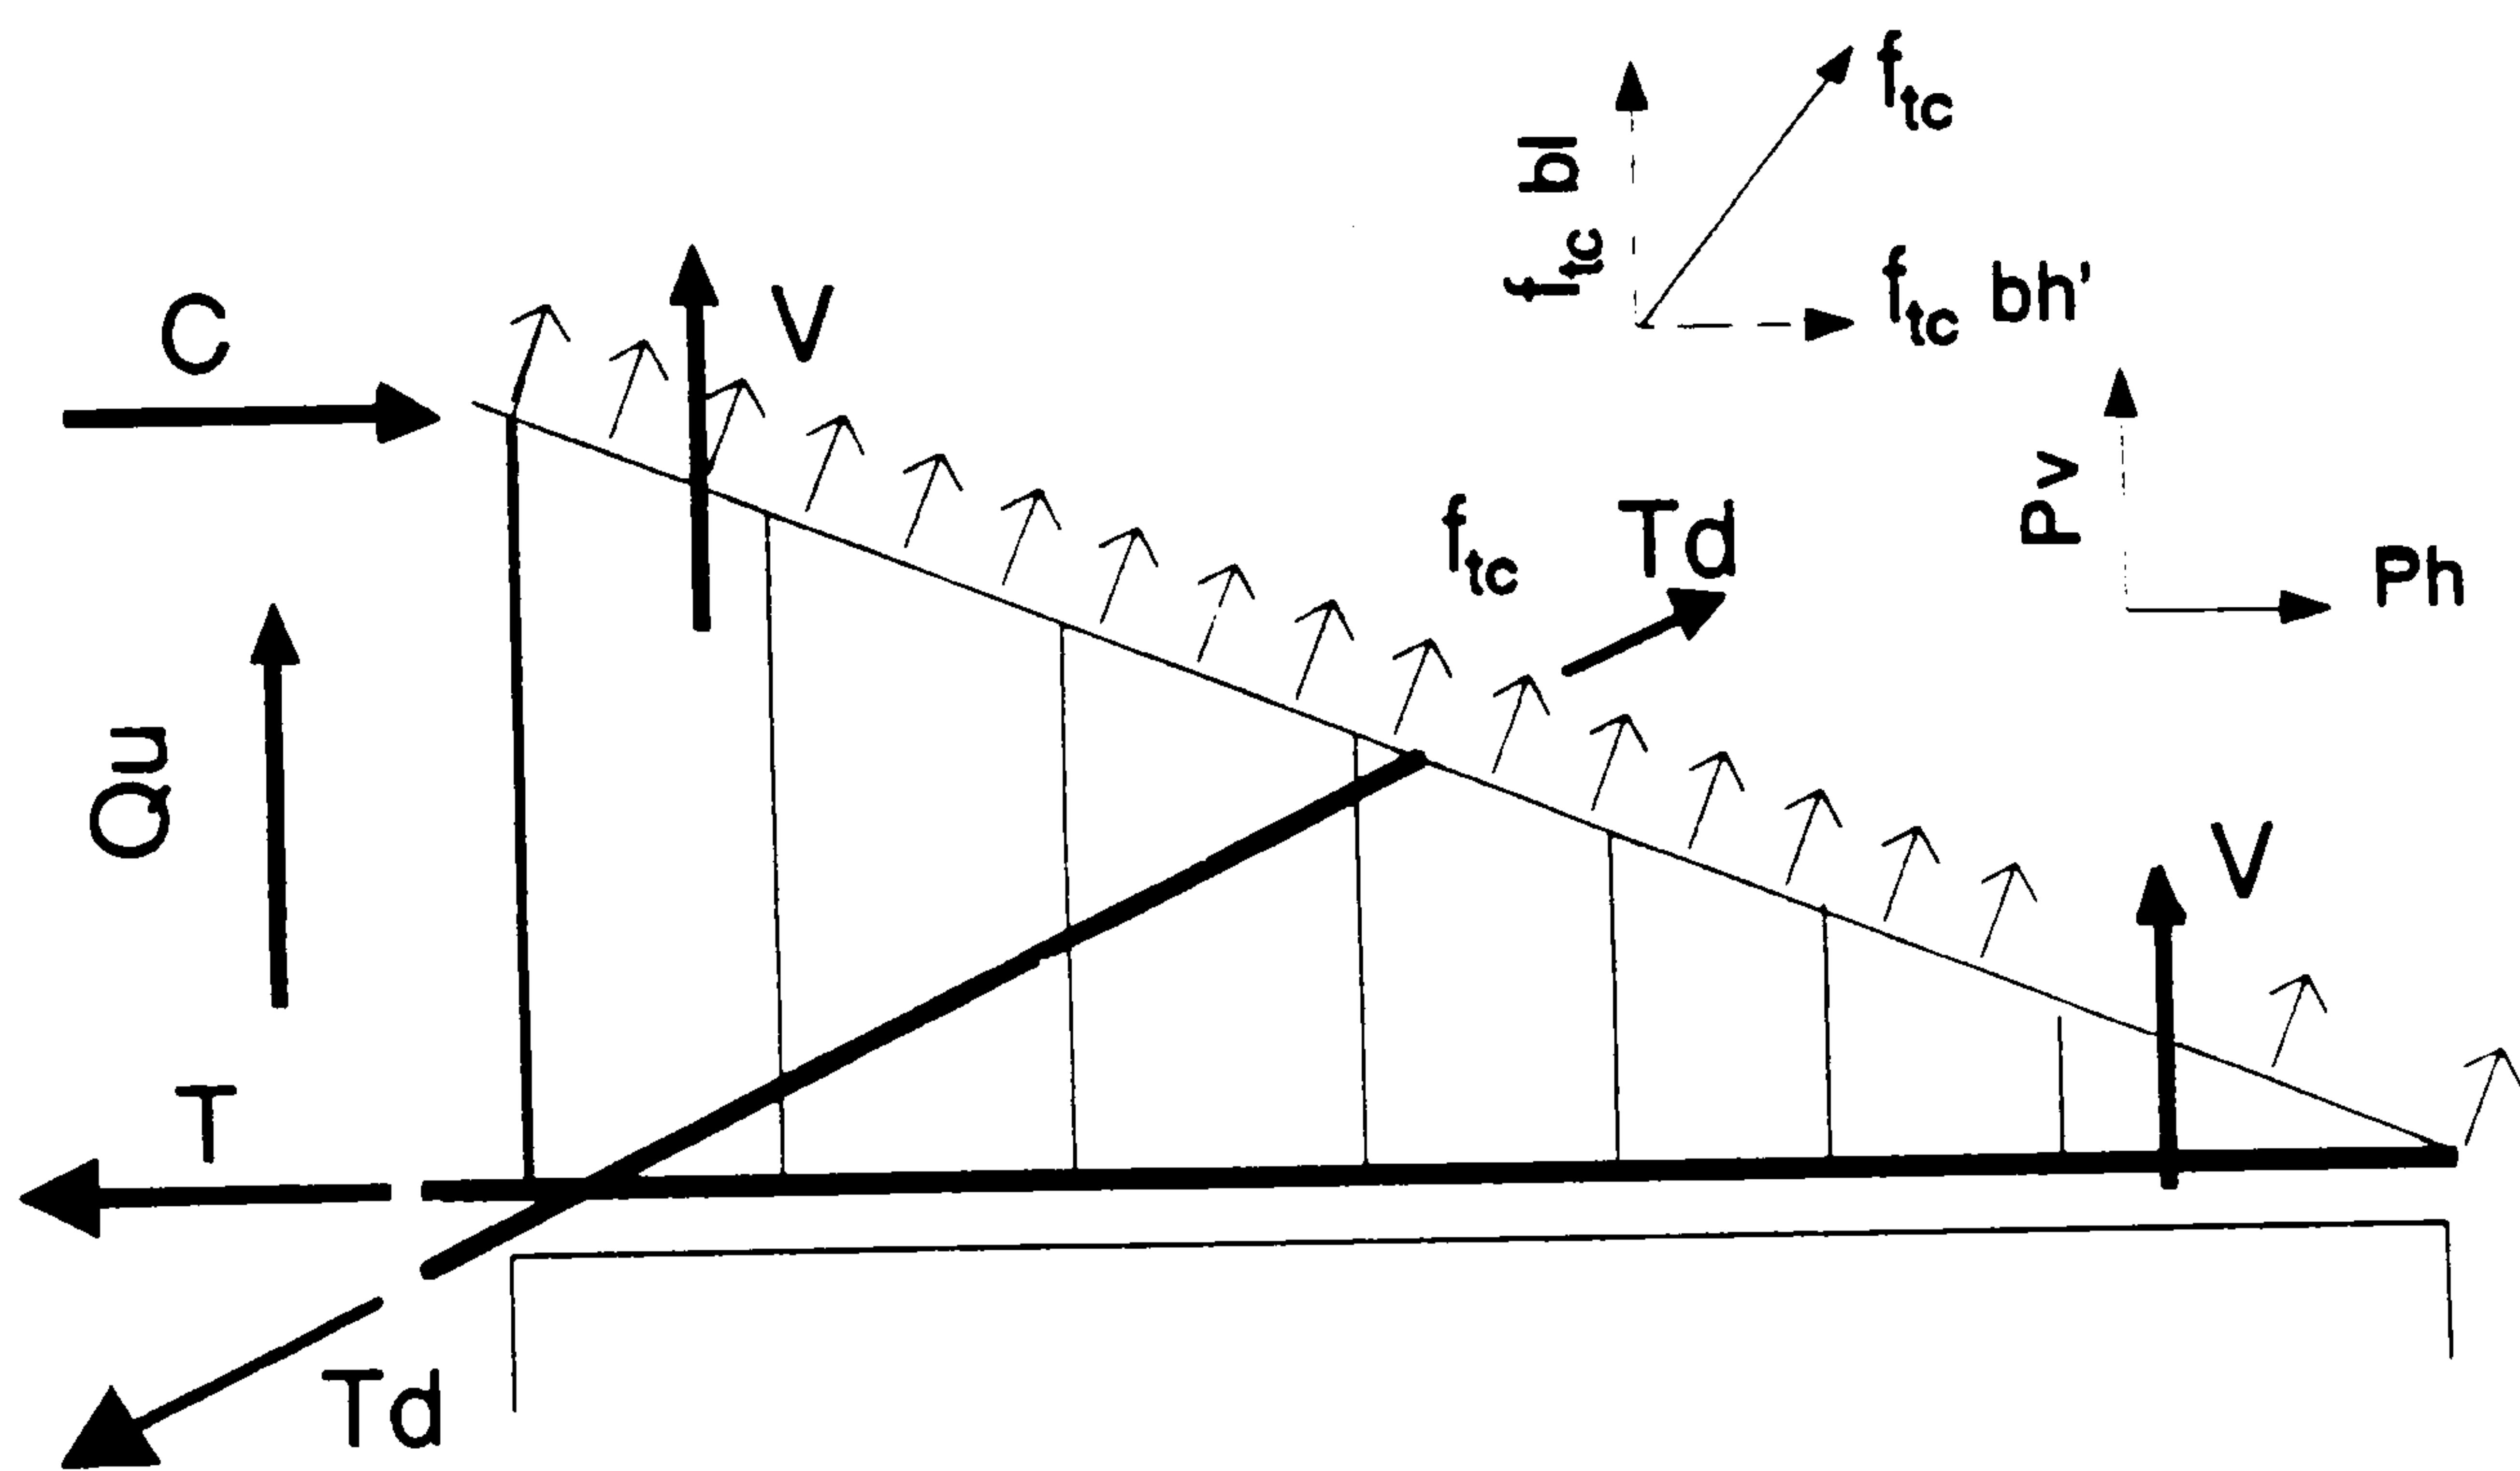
Beam with conventional and diagonal reinforcement bars
